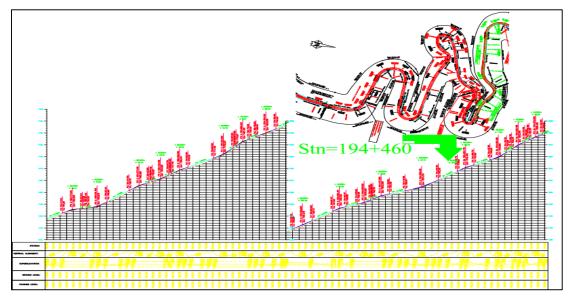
Plan and Cross Sectional Road at Shen Debitu 4th
